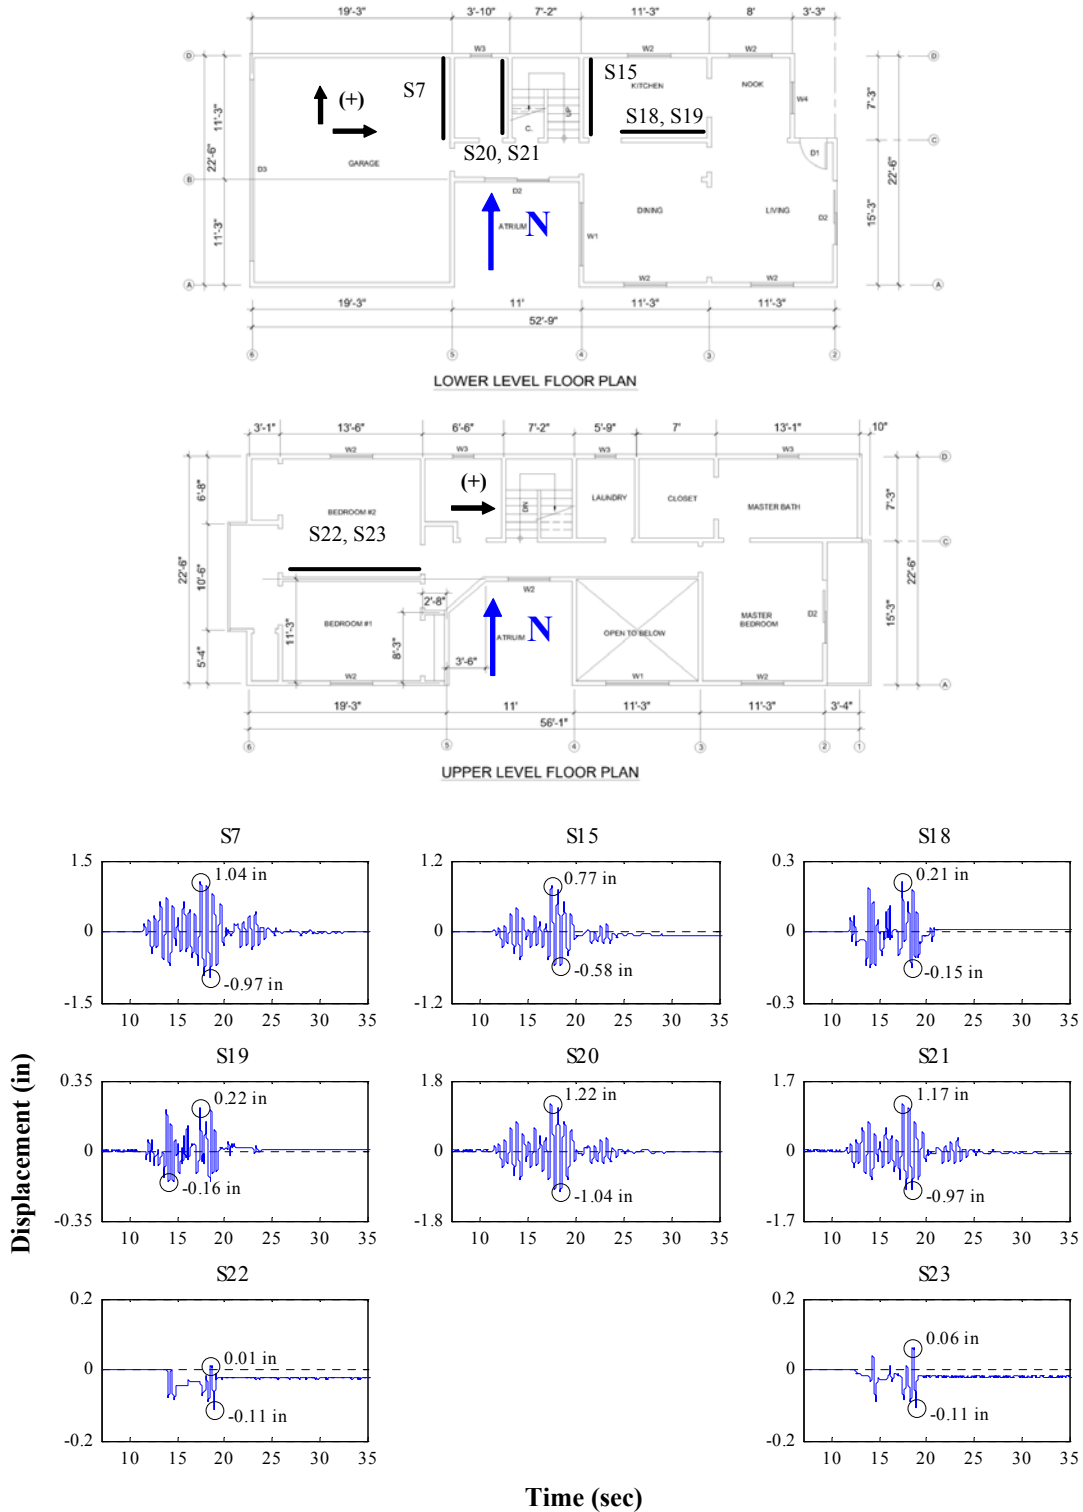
Wall deformations of internal walls for Test NWP1S06
